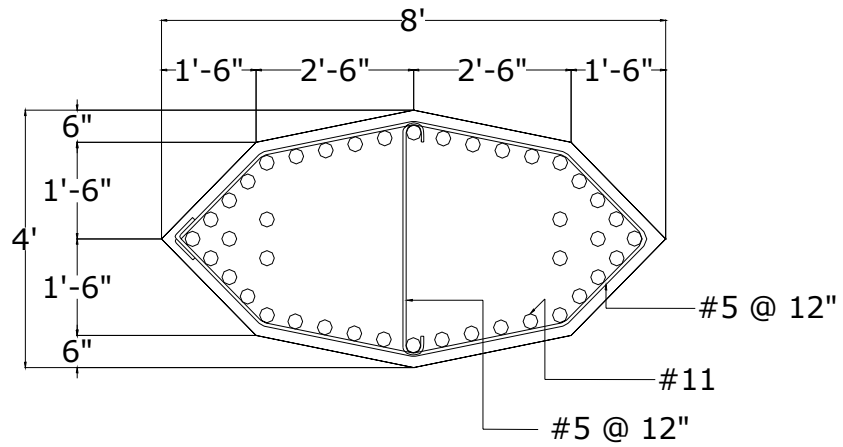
Cross Section of 8WD and 9WD Columns of 1RWD Off-Ramp (drawing not to scale)
